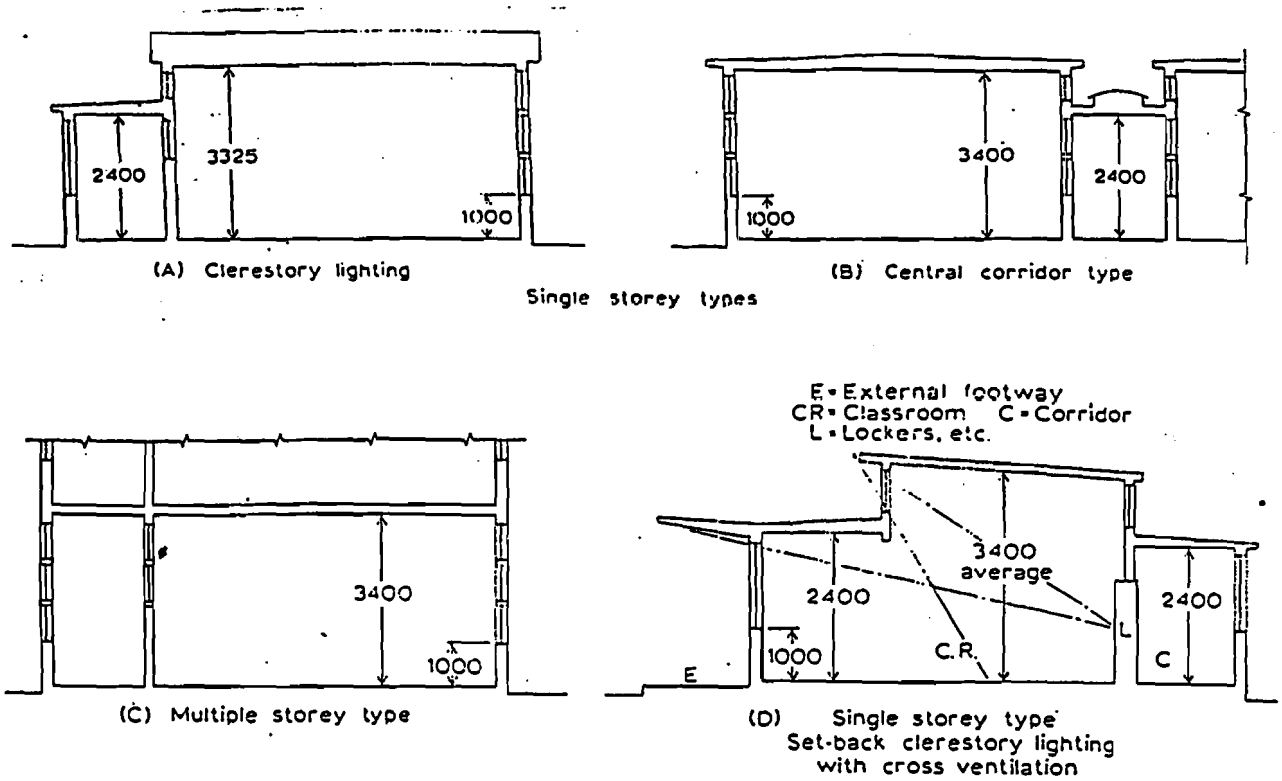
(A) to (C) Classrooms and corridors: lighting and ventilation; (D) Classroom and corridor sections
